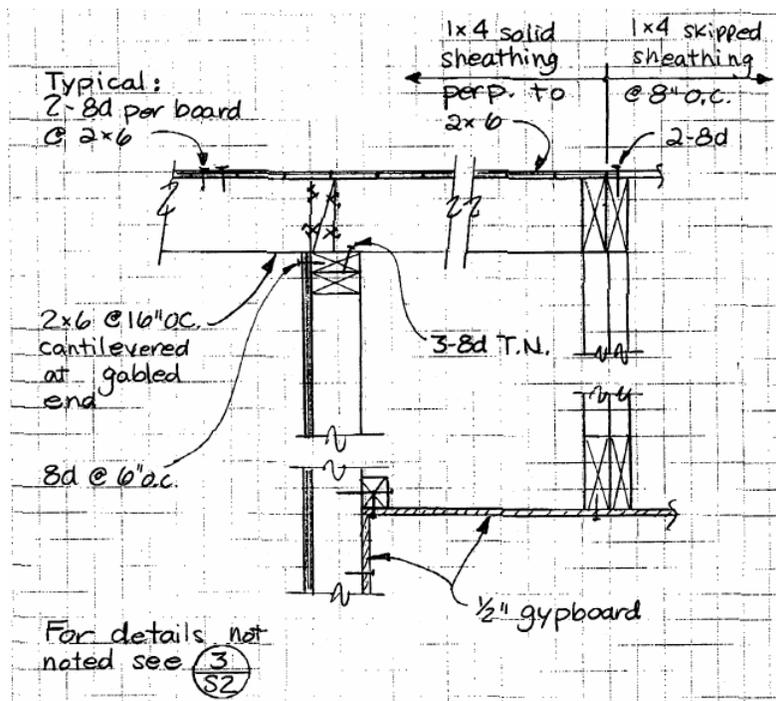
Index building 6 top of wall at gabled end (detail 4-S2)
